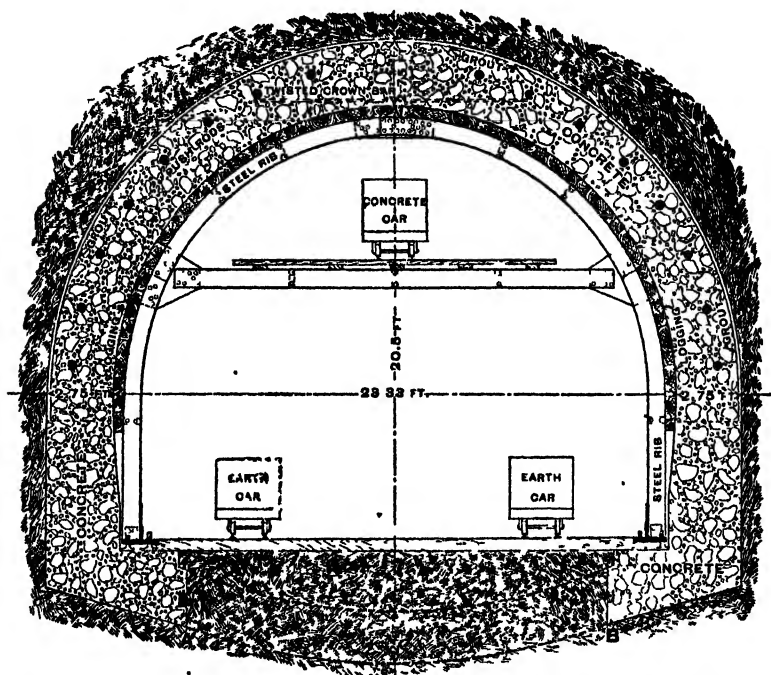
Section of East Boston Tunnel during Construction. (See p. 691.)
